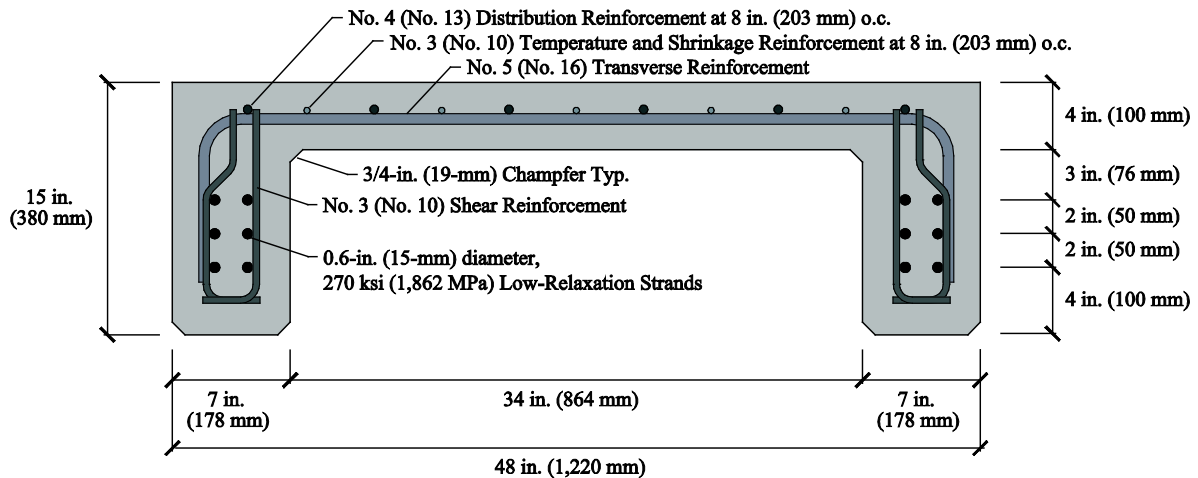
Reinforcement layout for girder H-PS-C-300-R-UO cross-section.
